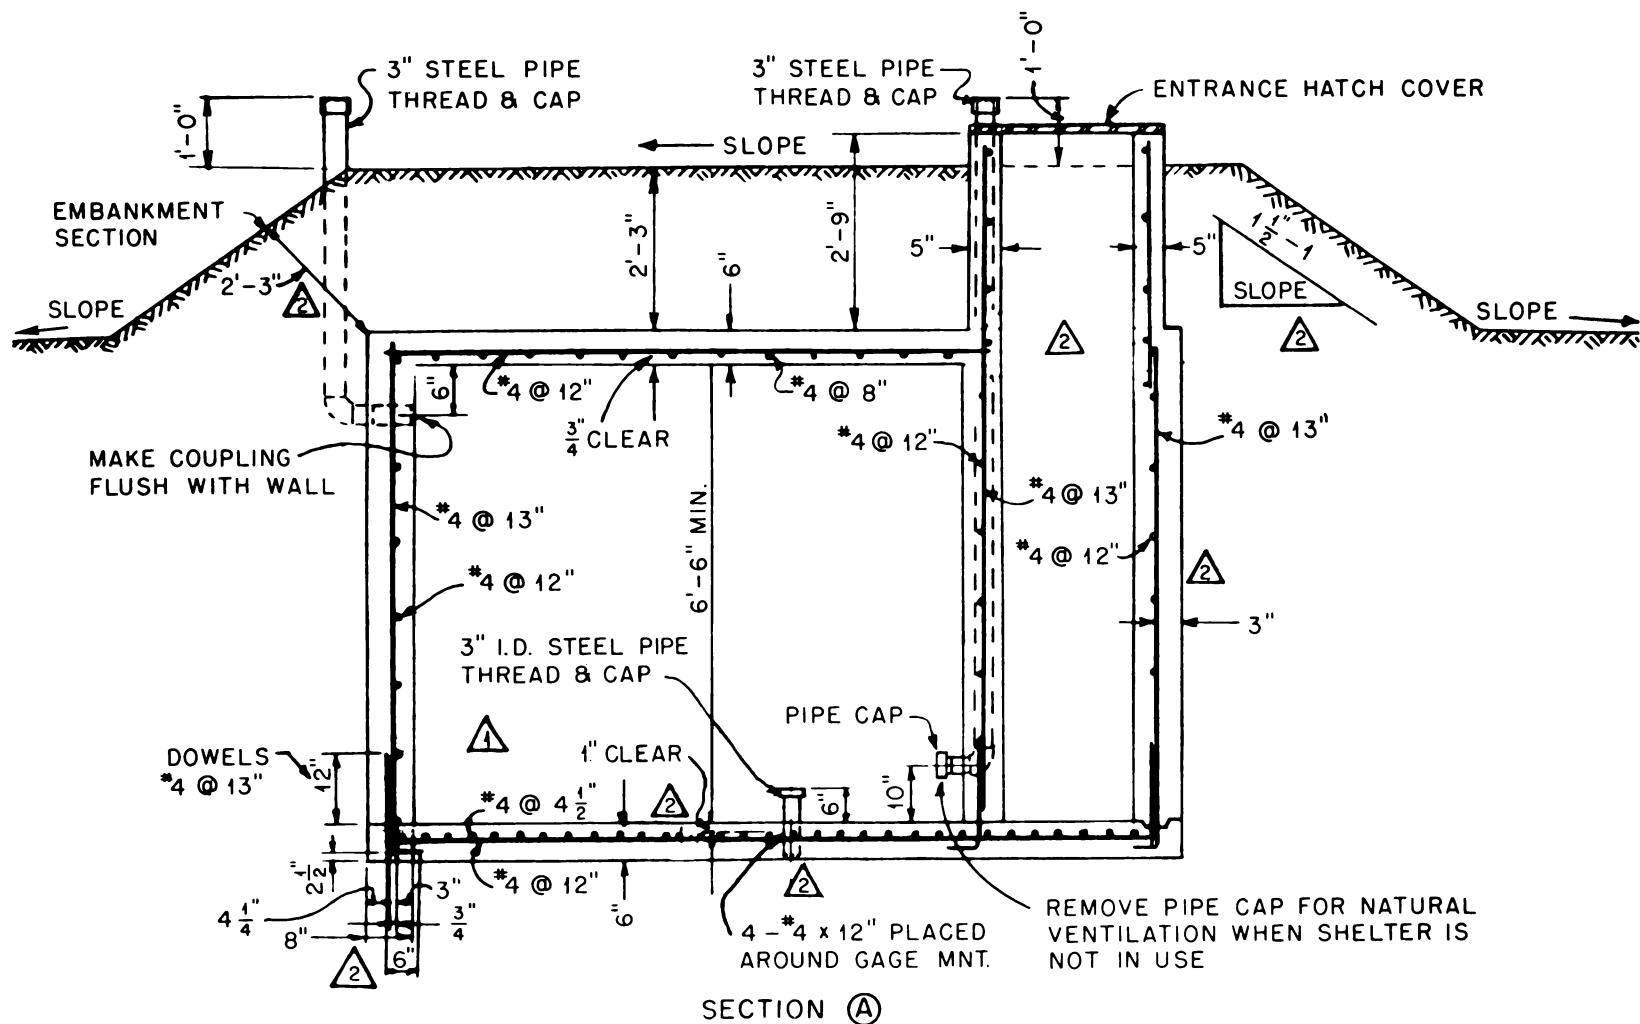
Basic underground family fallout shelter, longitudinal section.
